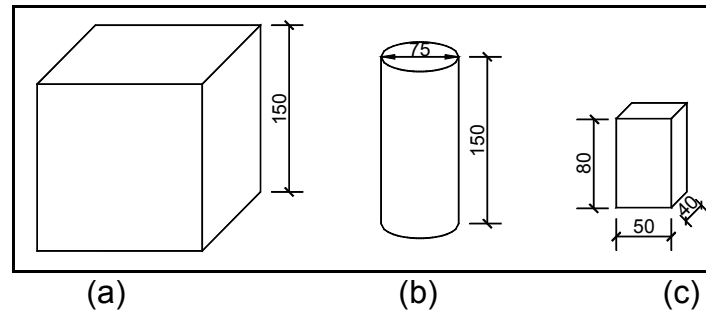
Geometry of the distinct specimens (dimensions in mm); (a) cubic specimens; (b) cylindrical specimens; (c) prismatic specimens
